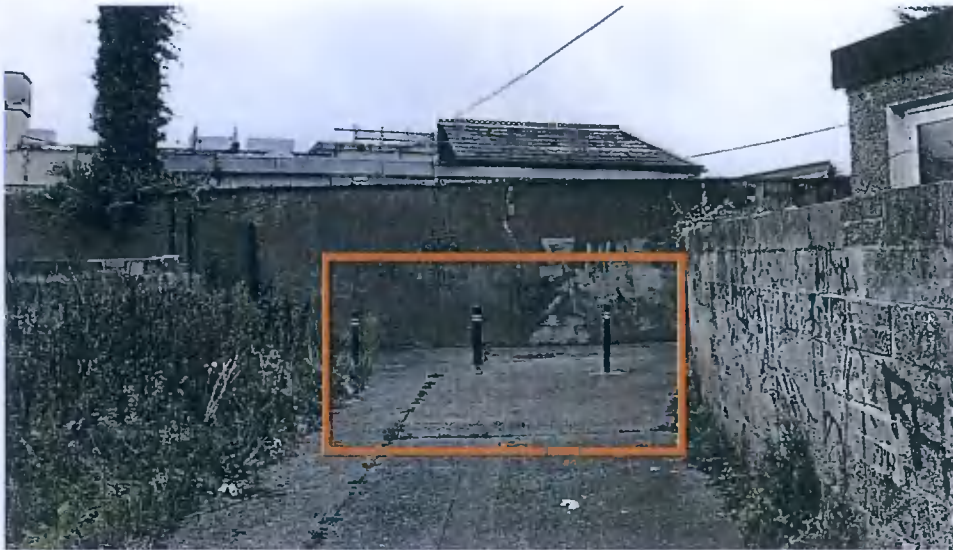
Existing laneway closed to vehicular traffic to the east of the Applicant site (BPS, Oct. 2021)
